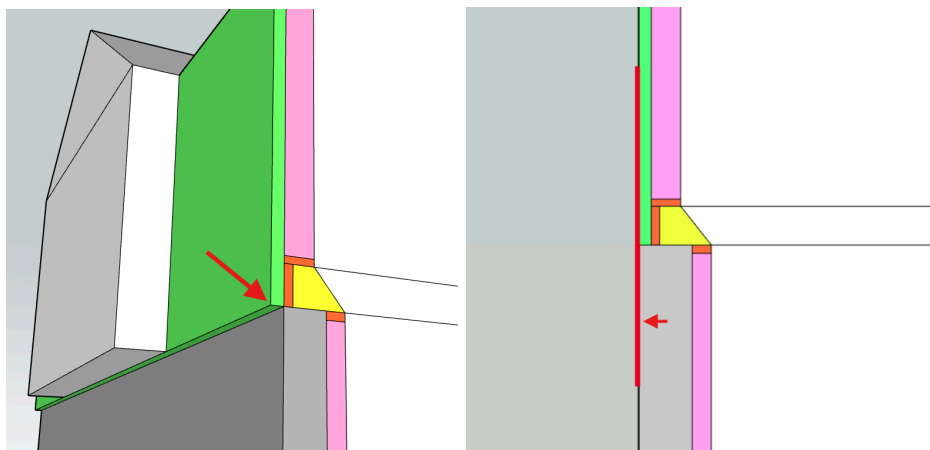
A basement wall is offset from the above grade wall due to the transition from exterior continuous insulation to interior cavity insulation. In this case, the above grade wall protrudes out further, so the basement wall should be extruded to align.
